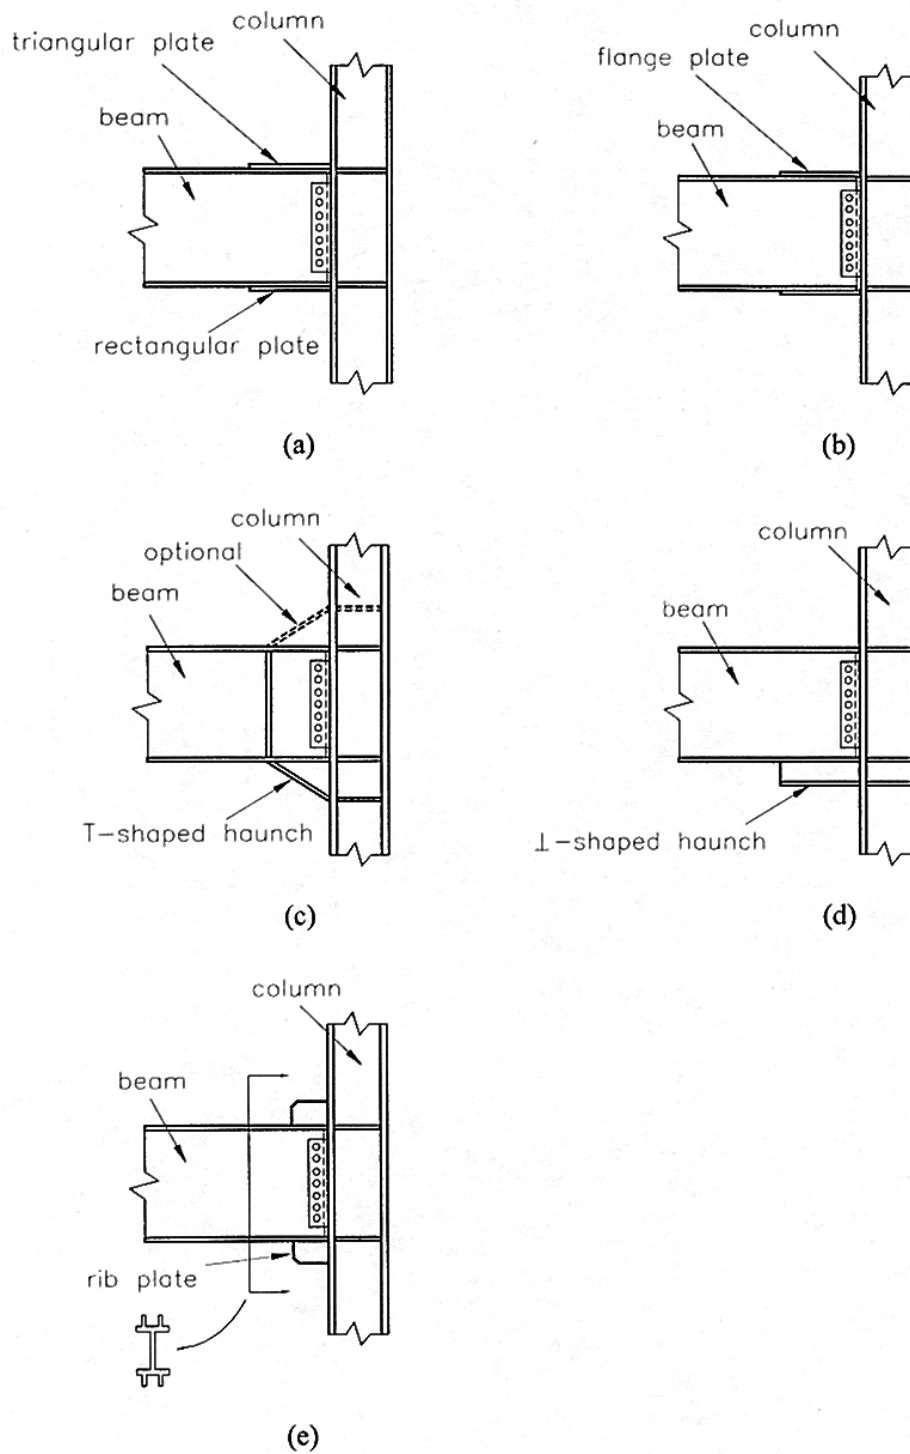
Reinforced moment connections: (a) cover plates, (b) welded flange plates, (c) triangular haunches, (d) straight haunch, (e) rib plates
